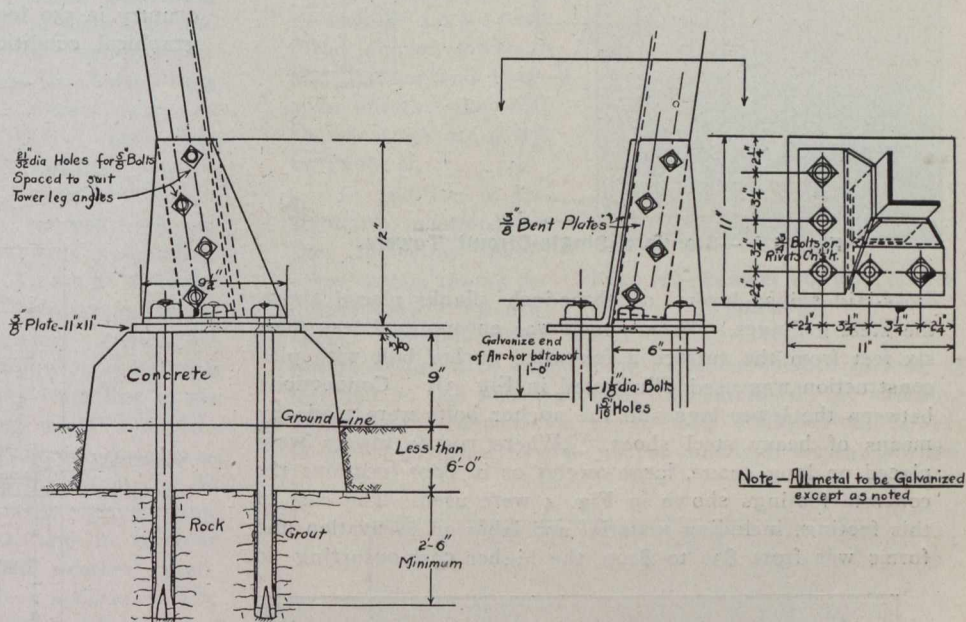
Tower Footing Where Rock Occurs Less Than 6 Ft. Below Earth Line.
